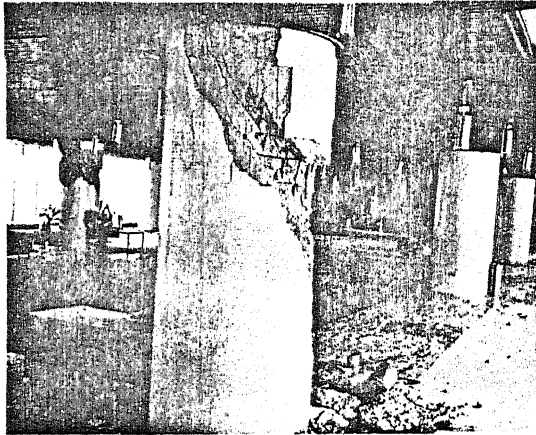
COLUMN FAILURE AT LEVEL 3
